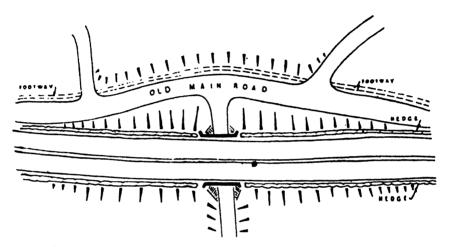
A new traffic artery paralleling an old main road. This is not to be recommended; but if in providing the trunk road system for future needs, the line of the existing main roads should have to be slavishly followed, an arrangement as shown above would be the soundest form of planning. The diagram is a rough sketch conveying the idea; it is not a scale plan. Instead of attempting to widen the existing road, the idea would be to construct a new dual carriageway road beside it, the old road being left just as it is—for two reasons: first, the old road will carry all the traffic until such time as the new road is available, and secondly, when the work is finished, the old road will become a local road which, completely separated from the new artery, will absorb all the old minor junctions, thus keeping the new road free from junctions except at big roundabouts at long intervals. At those occasional roundabouts, and there only, the old and the new road will be linked. The whole affair would be costly and troublesome, and a new motor road through land acquired at agricultural values is definitely to be preferred.
